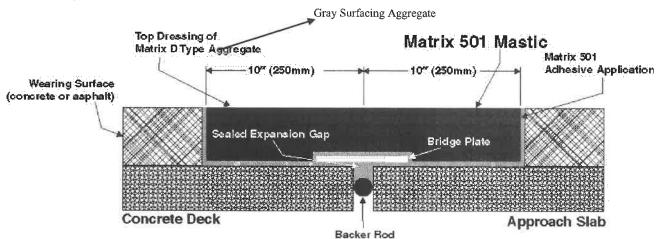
Typical Matrix 501 Asphaltic Plug Bridge Joint System Installation
